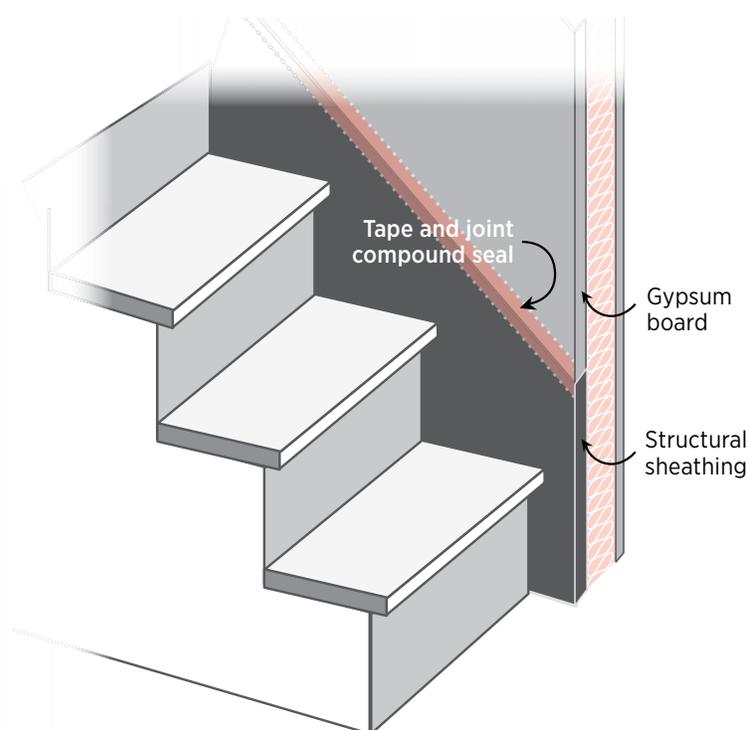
Install an air barrier and air sealing on exterior walls behind stairs. If the area behind the stairs is inaccessible, caulk stairs where they meet the wall. Use caulk if the area is already painted; use tape and joint compound if area will be painted.
